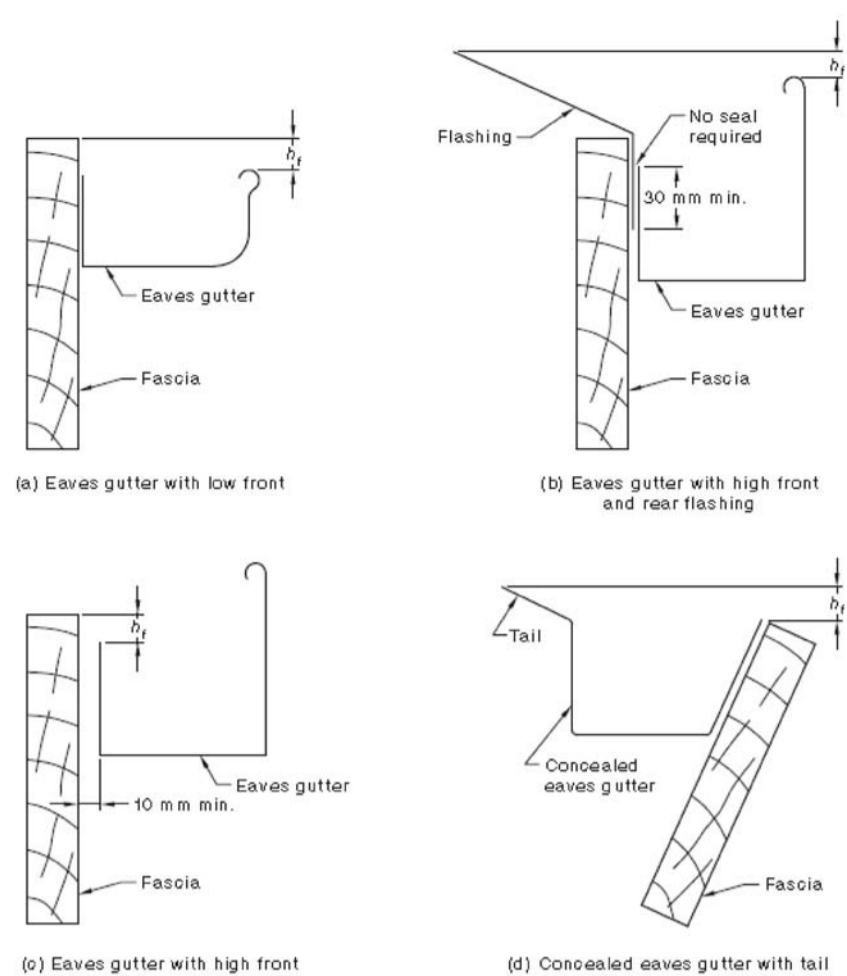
EAVES GUTTER OVERFLOW METHODS
